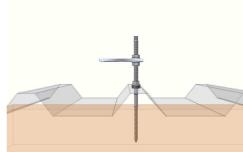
Correctly fitted hanger bolt with connector plate
